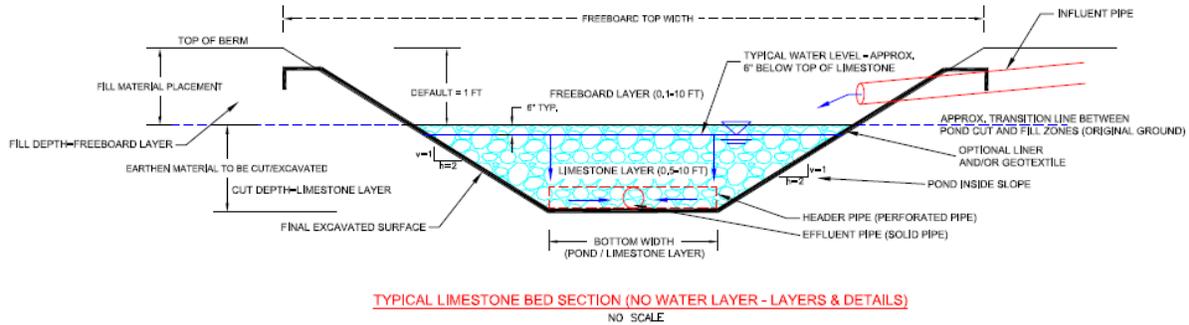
Typical Cross Section View of a Limestone Bed (LB) without a water layer.
